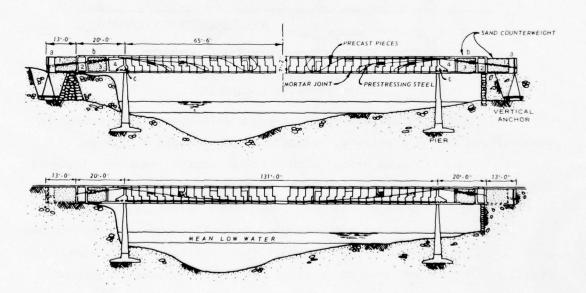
Temporary and permanent sections of prestressed, precast bridge (from Reference 26)
